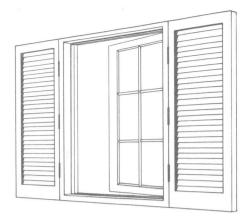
Shutters may be louvered or have inset panels of fabric or rigid plastic sheets. Adjustable louvers are available. Used here with an outward-swinging casement window.
